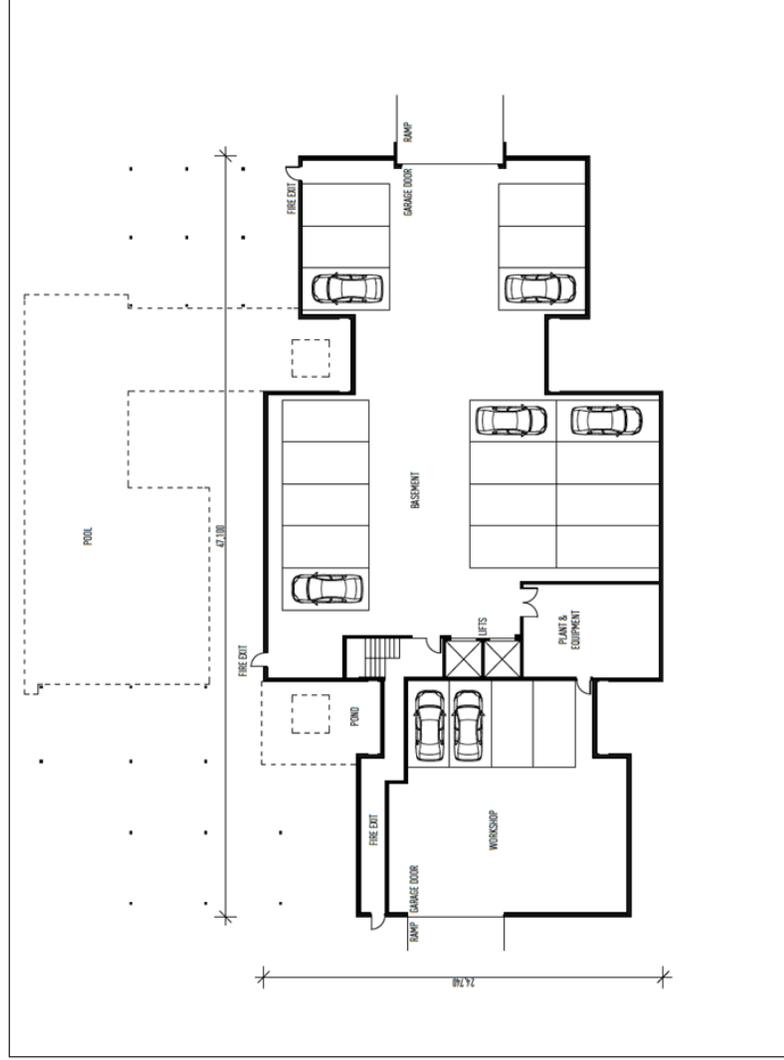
CENTRAL FACILITY BASEMENT FLOOR PLAN
